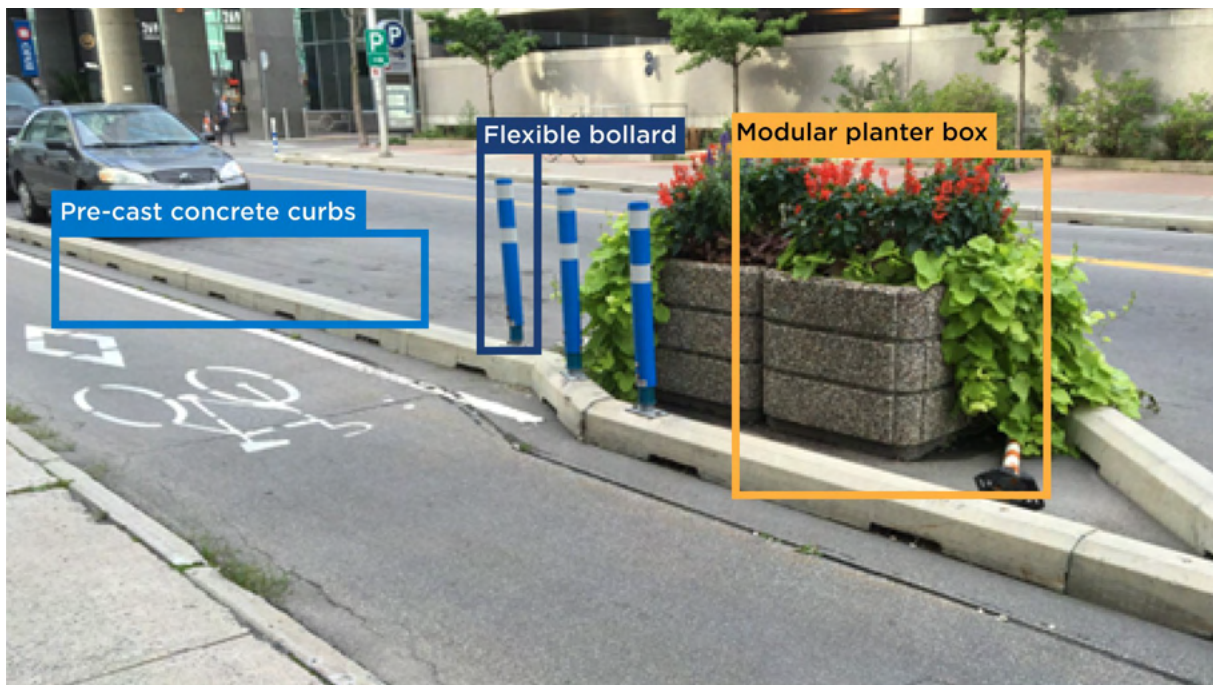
Small precast concrete curb, flexible bollards, and modular planters creating curb extension “bump-out”.
